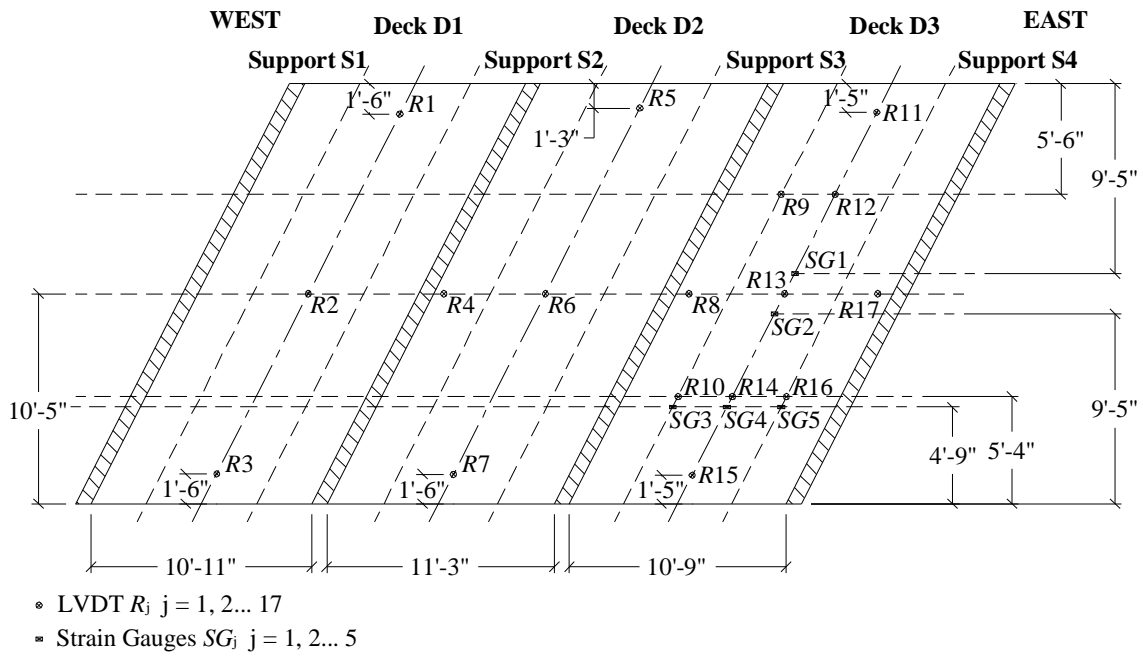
LVDT and Strain Gage Positions in the Load Test after Strengthening
